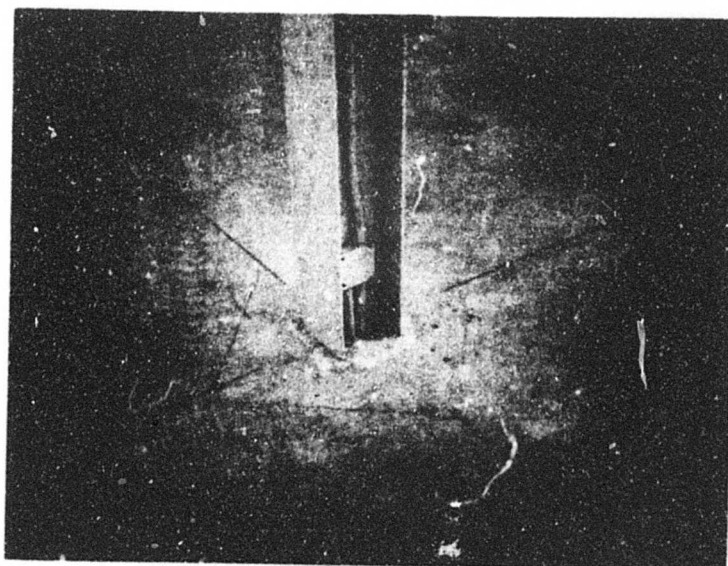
Newer construction showing diamond-shaped isolation joint around column.
